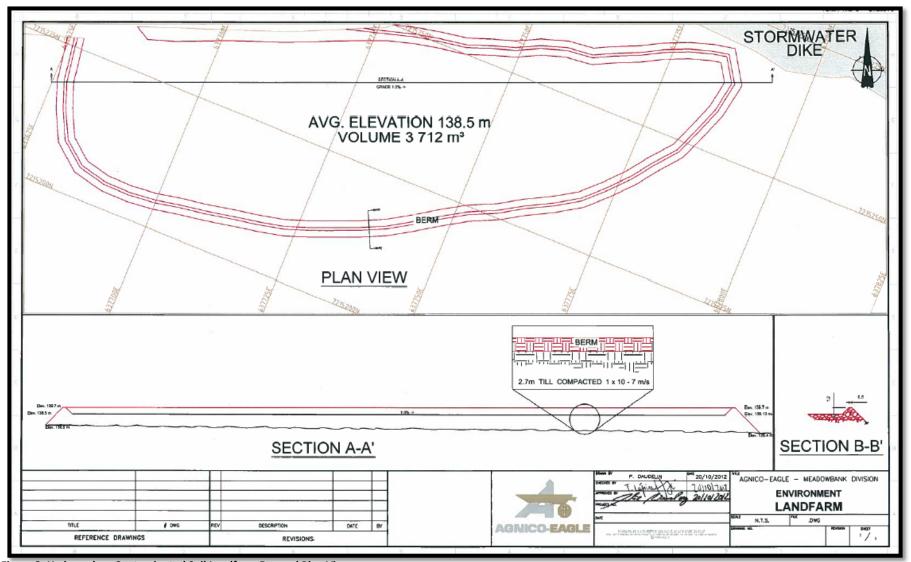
Hydrocarbon Contaminated Soil Landfarm Bermed Plan View
